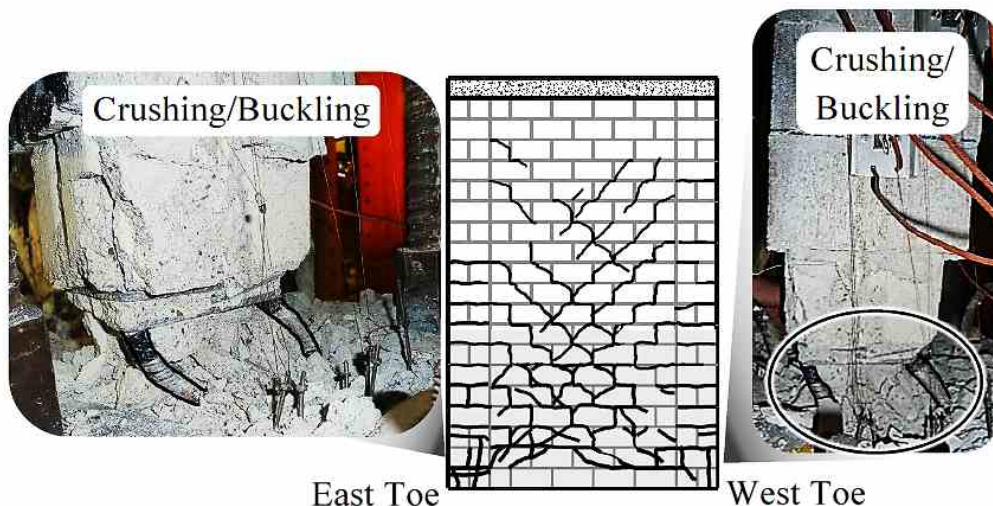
Crack Pattern and Failure Mechanisms of Wall 1
